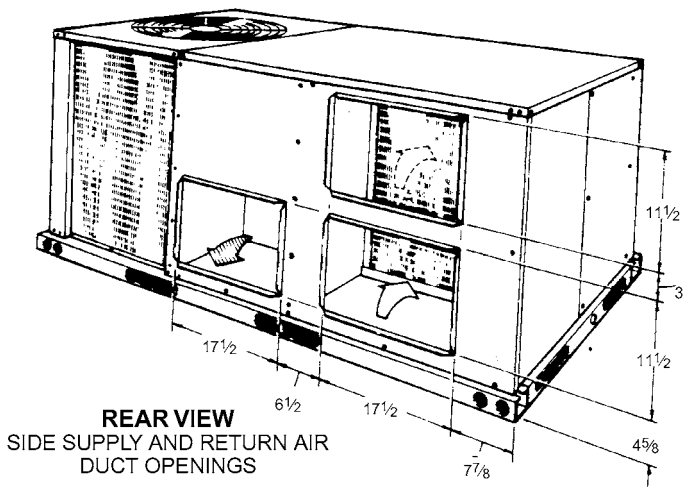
UNIT DIMENSIONS (REAR VIEW)
